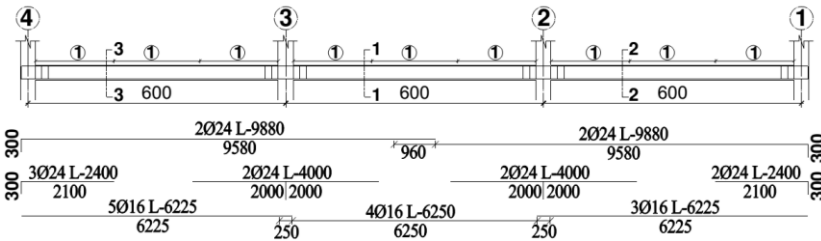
Sample slab detailing for G+2 building with C-40 concrete
